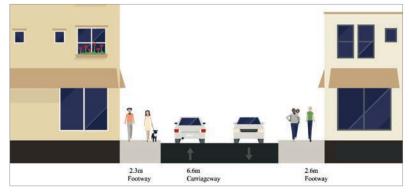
High Street Existing (without side street parking) (© Street Mix)
